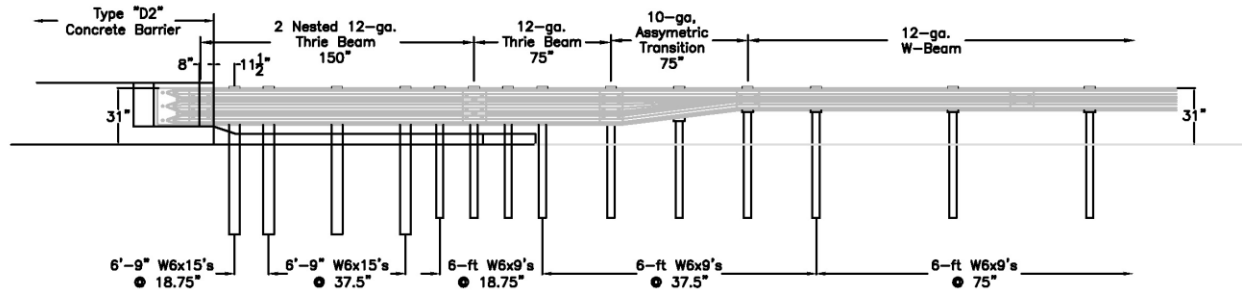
Details, MASH TL-3 Crashworthy HDOT AGT to Concrete End Post
